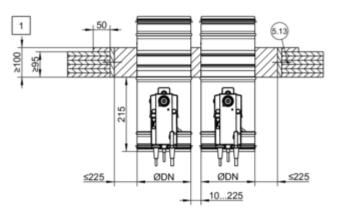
Mortar-based installation into a solid wood wall or CLT wall
